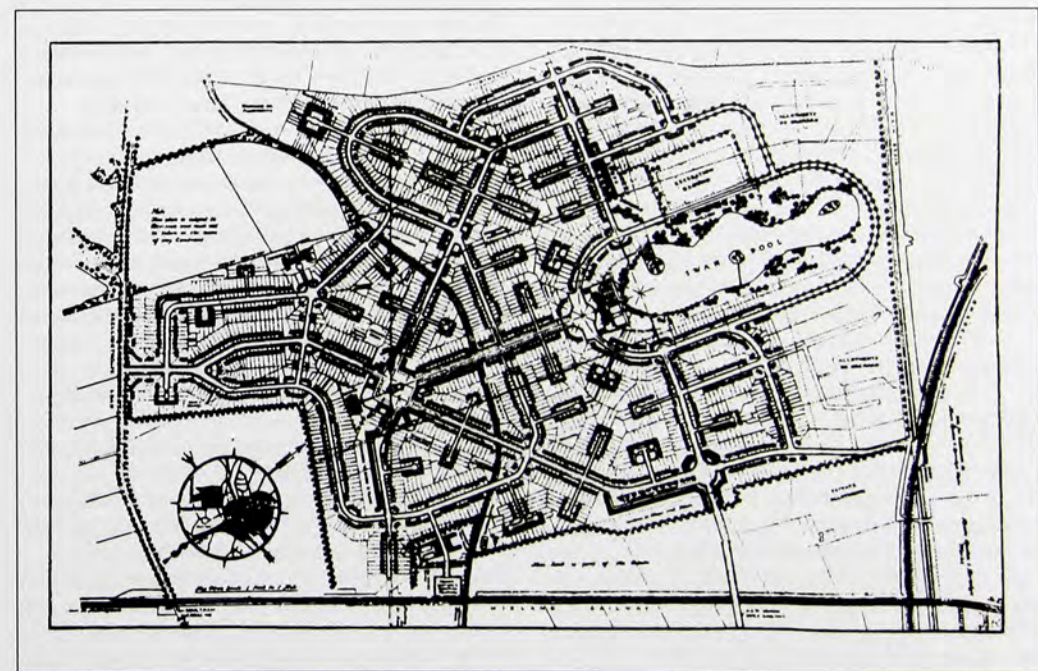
Plan of Swanpool Garden Suburb, Lincoln.
